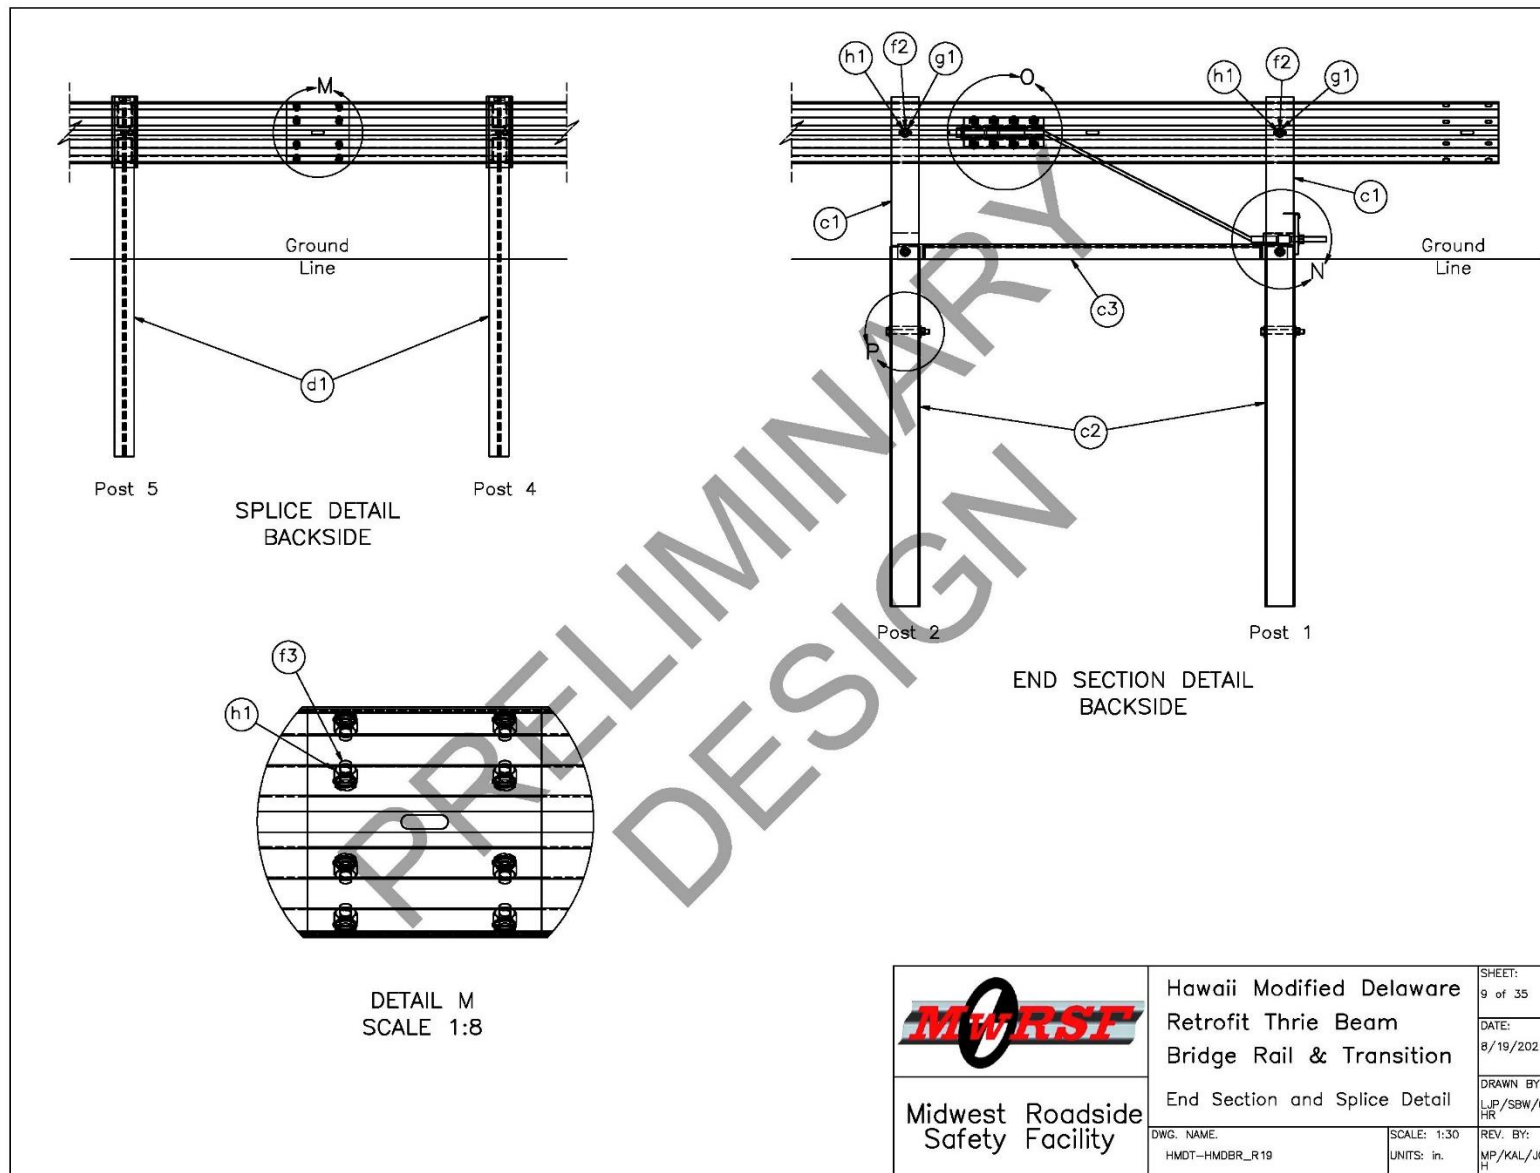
End Section and Splice Detail, Test No. HMDT-1
